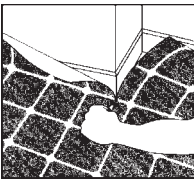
Outside Corners: Relief cuts are then made at the outside corners, from the top of the lapped up material to where the floor and wall meet.
